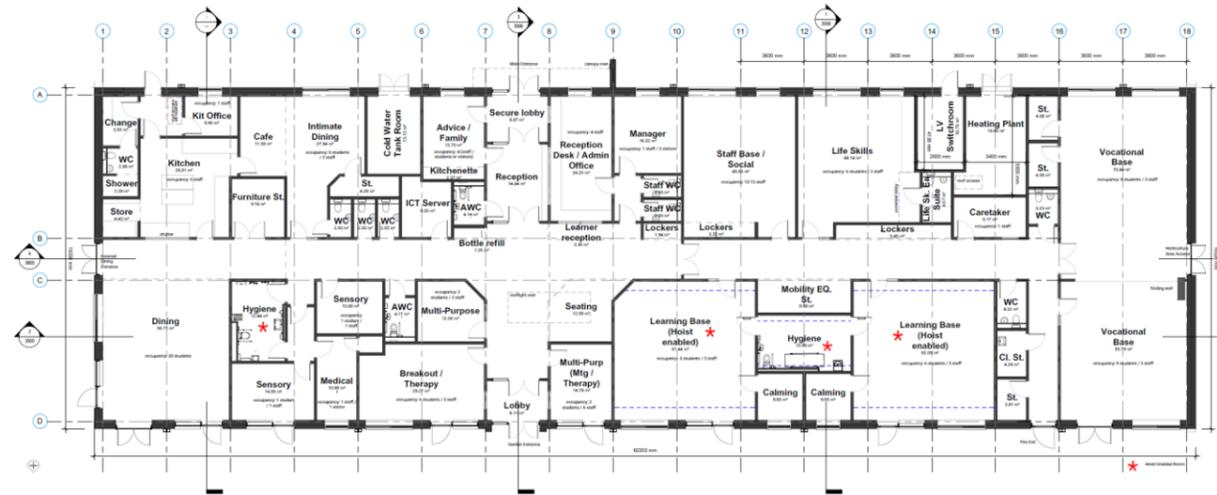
Ground & First Floor Plan. Courtesy: Pozzoni Architects
